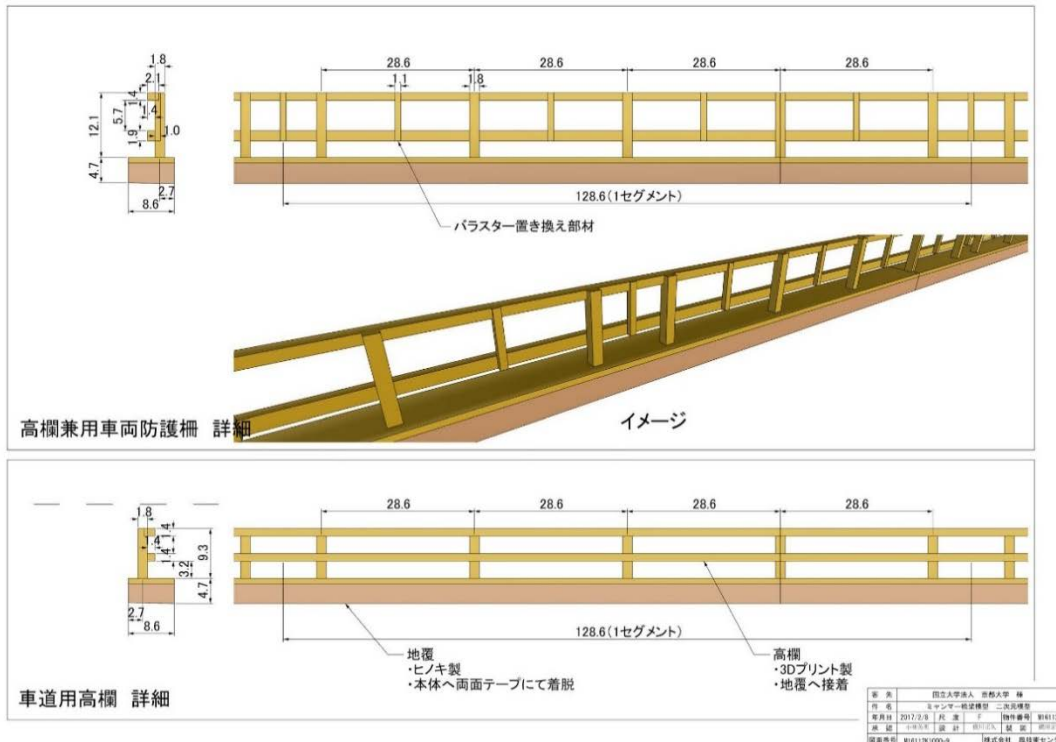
The parapets (upper: to be installed at both edge of the girder deck, lower: to be installed at the center, unit in mm)
